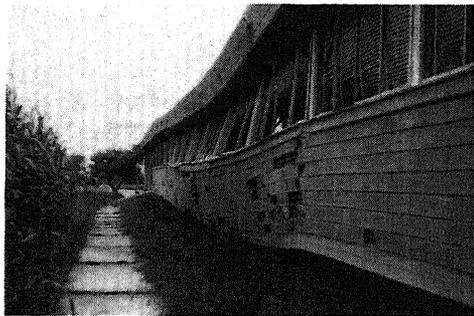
CANTILEVER AND SHORT COLUMNS IN SCHOOLS BUILDING
